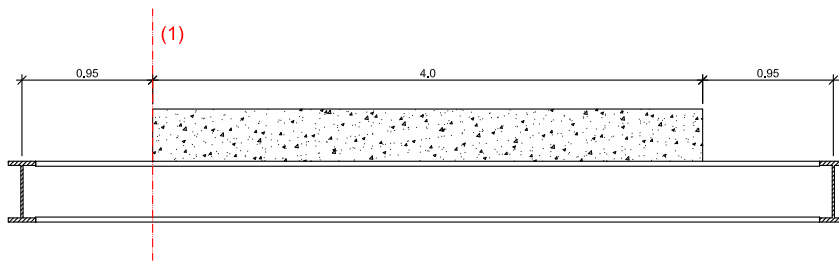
A transversal cut through the bridge, showing the the cross section of the longitudinal beams, the transversal beam and the deck.
